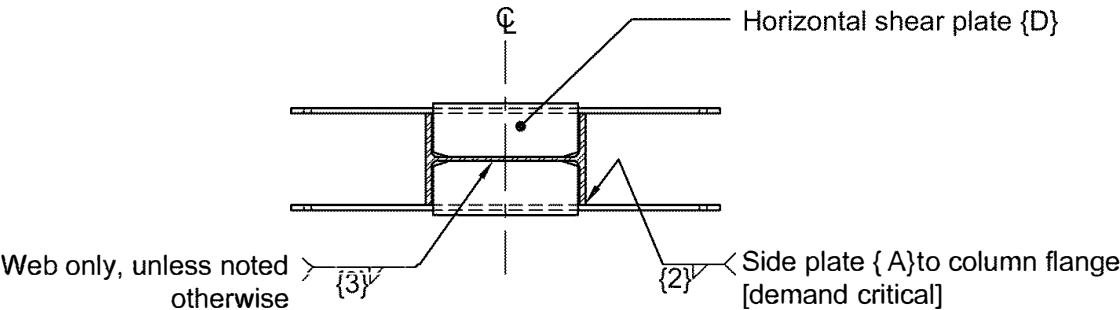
Two-sided SidePlate moment connection (B-type), column shop detail.
